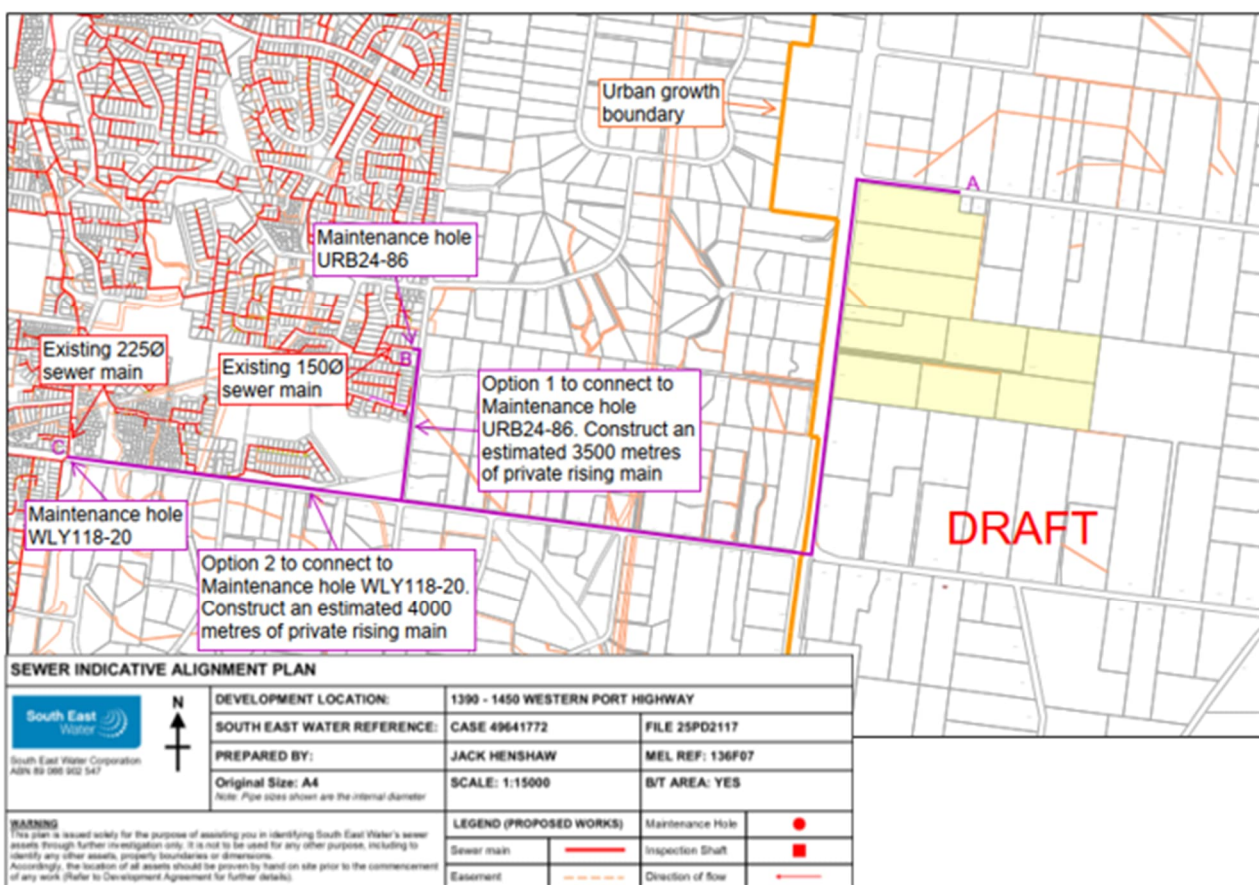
SEW Indicative sewer alignment plan (SEW Asset Map, September 2025)
